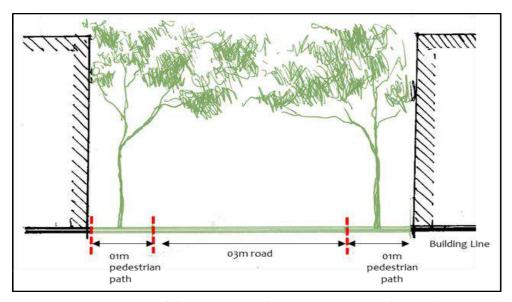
A cross section of the Ravana Temple & Cave Access Way showing the proposed walk paths and tree lines
